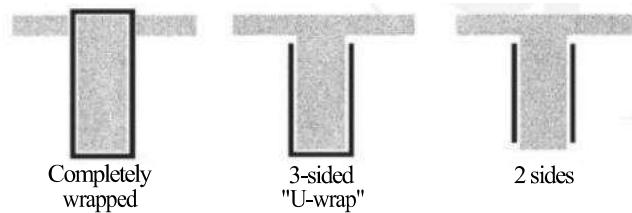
Typical wrapping schemes for shear strengthening using FRP laminates.
